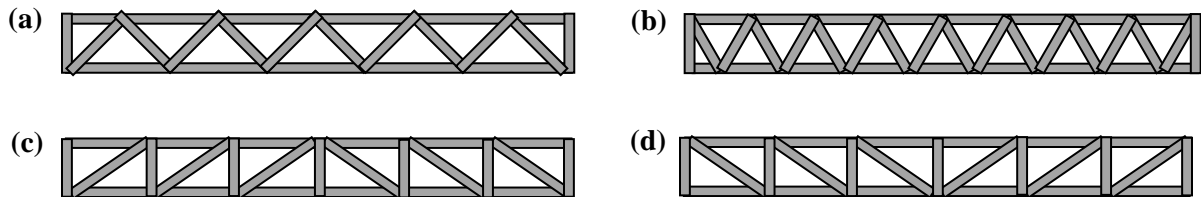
Different types of trusses developed in the late 1800s and early 1900s, including (a) the Neville Truss, (b) the Warren Truss, (c) the Howe Truss, and (d) the Pratt Truss.
